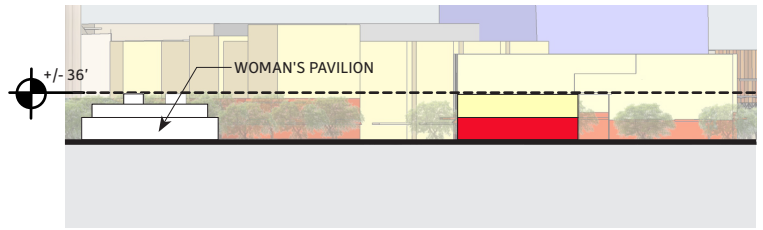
South Elevation of HNC Allowable Massing Envelope
